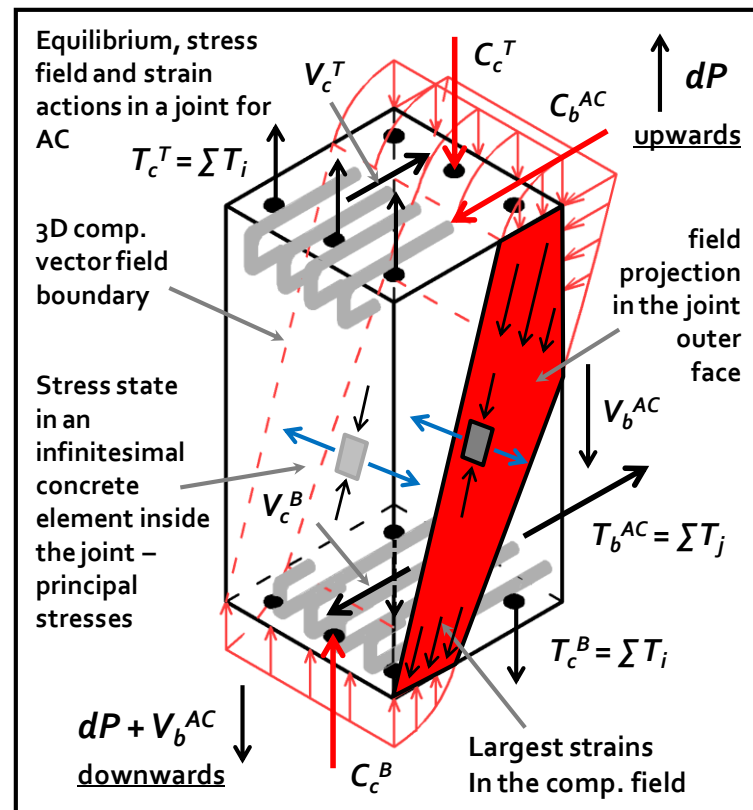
Force equilibrium at diagonal compression failure in left corner joint.
